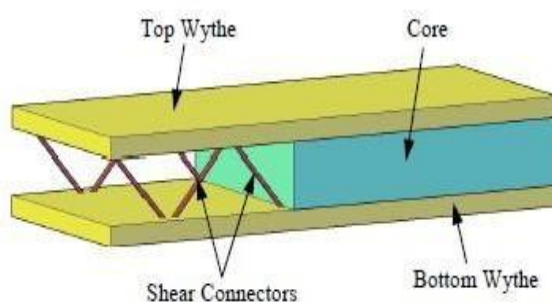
TYPICAL CONCRETE SANDWICH PANEL (CSP)
